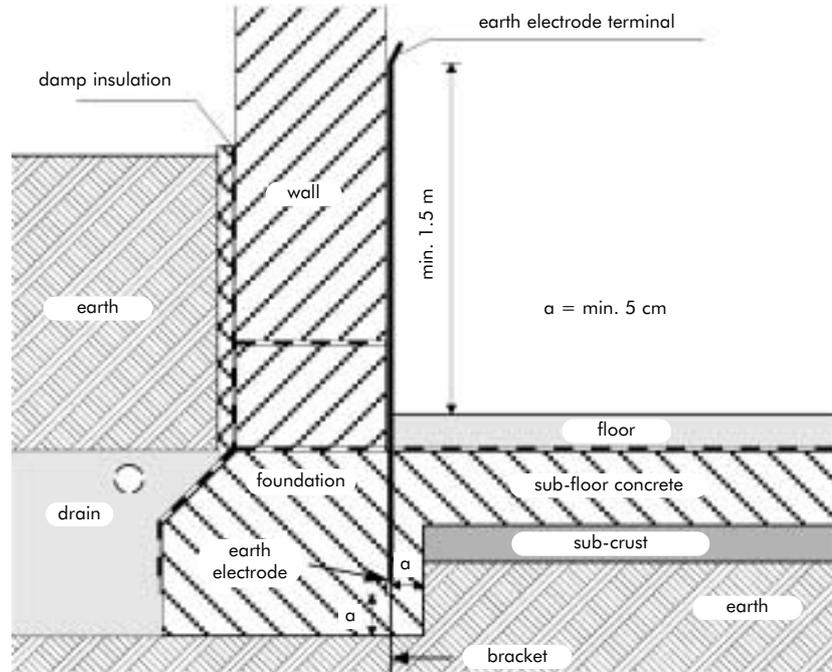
Illustration of the placement of the foundation earth electrode in a foundation without concrete reinforcement
